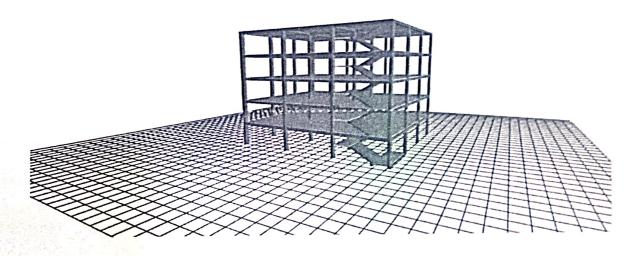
OUTER ELEVATION OF G+2 BUILDING AS PER PLAN
